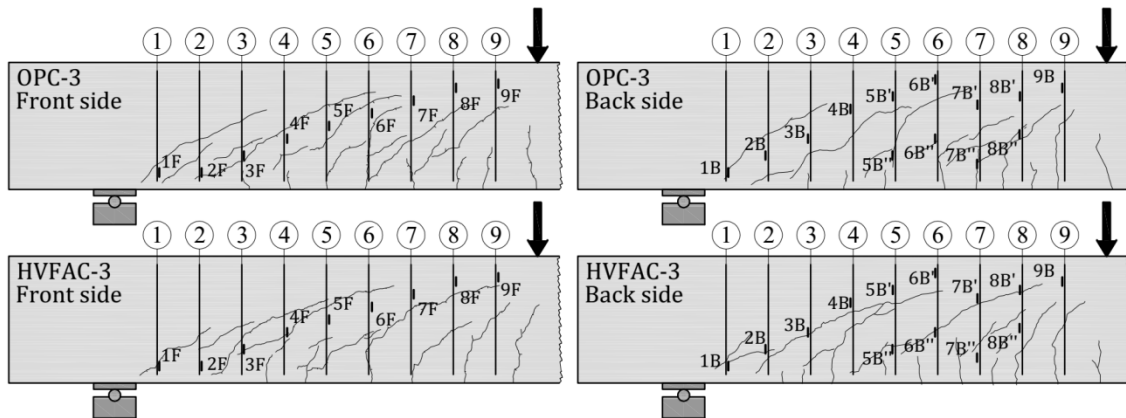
Crack patterns prior to failure in beams OPC-3 and HVFAC-3
